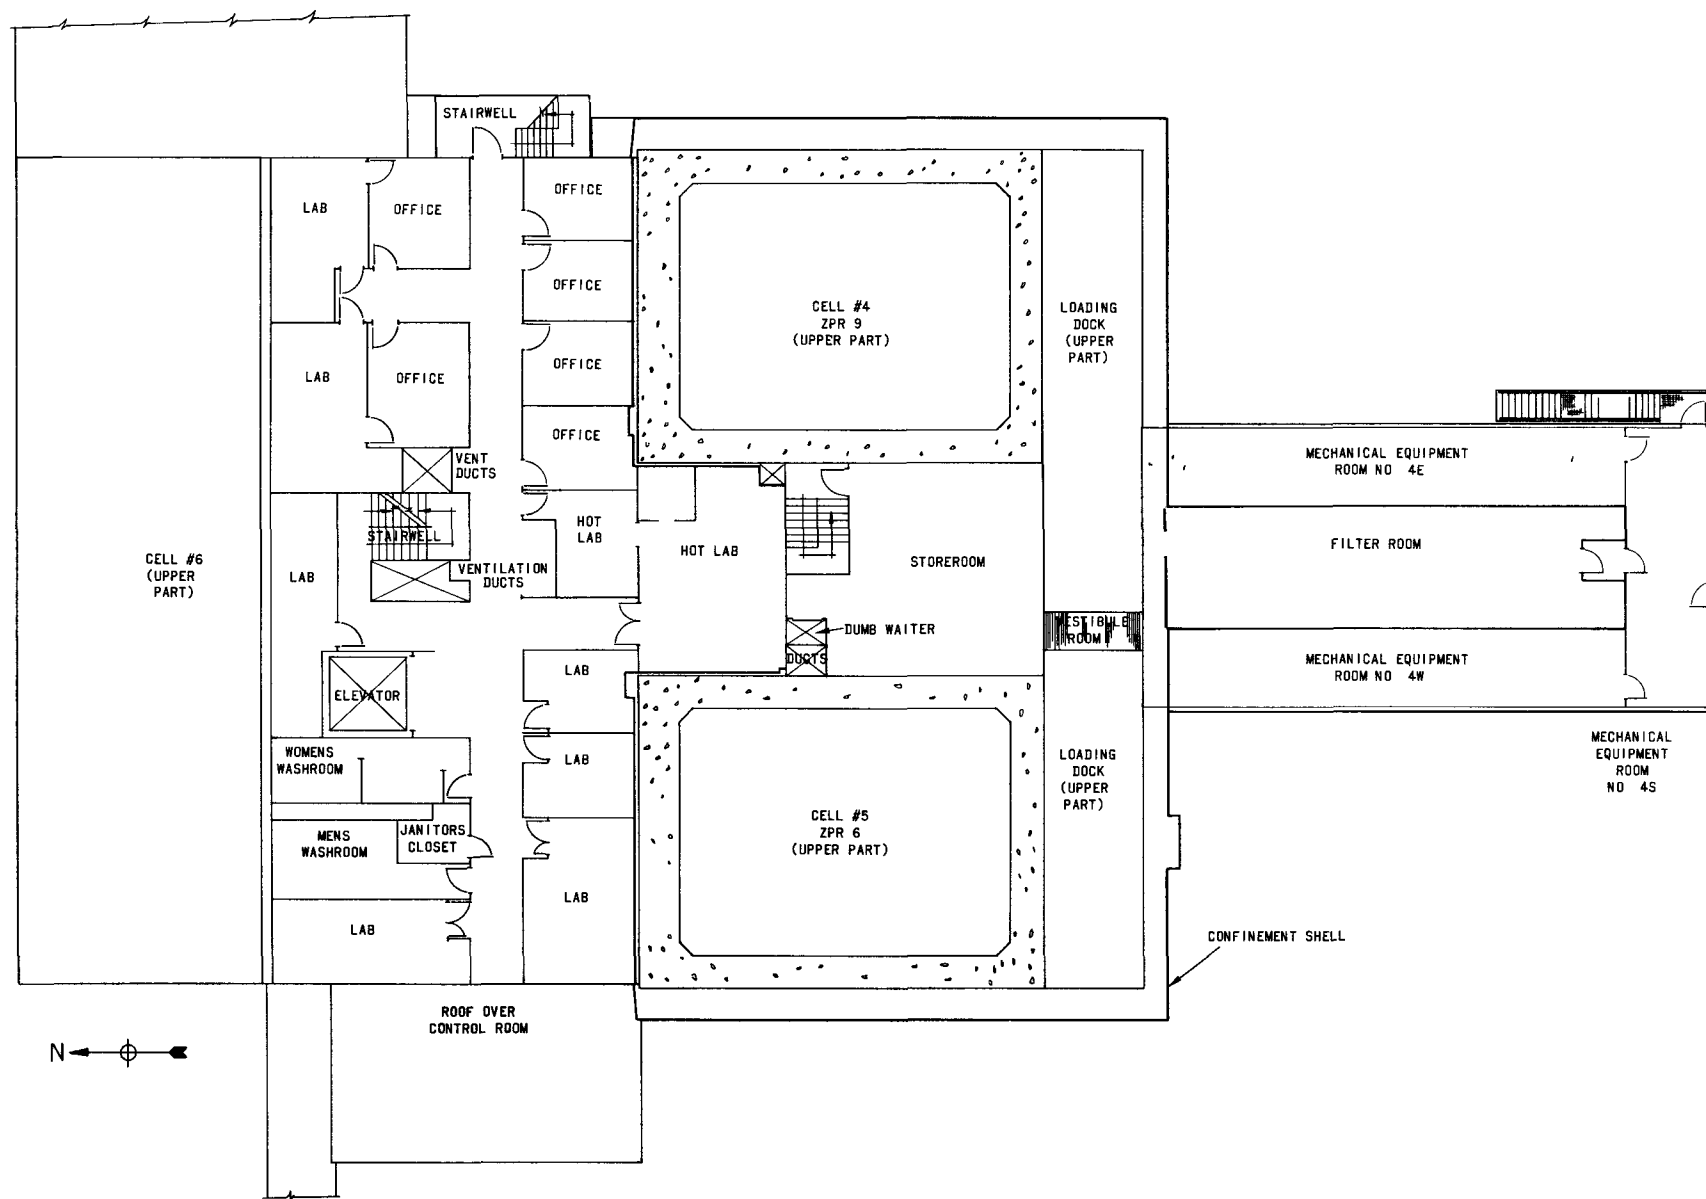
Second Floor Plan, Bldg. 316-W
